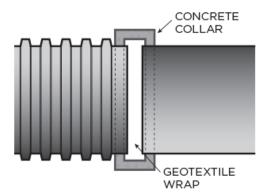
Example of concrete collar coupler with geotextile wrap
